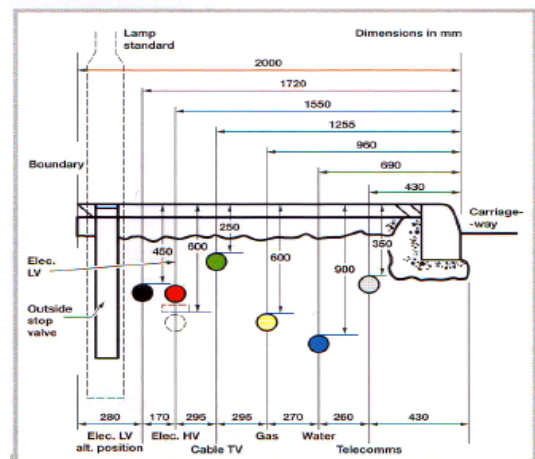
Typical layout of Utilities plant in a 2m wide footway.
